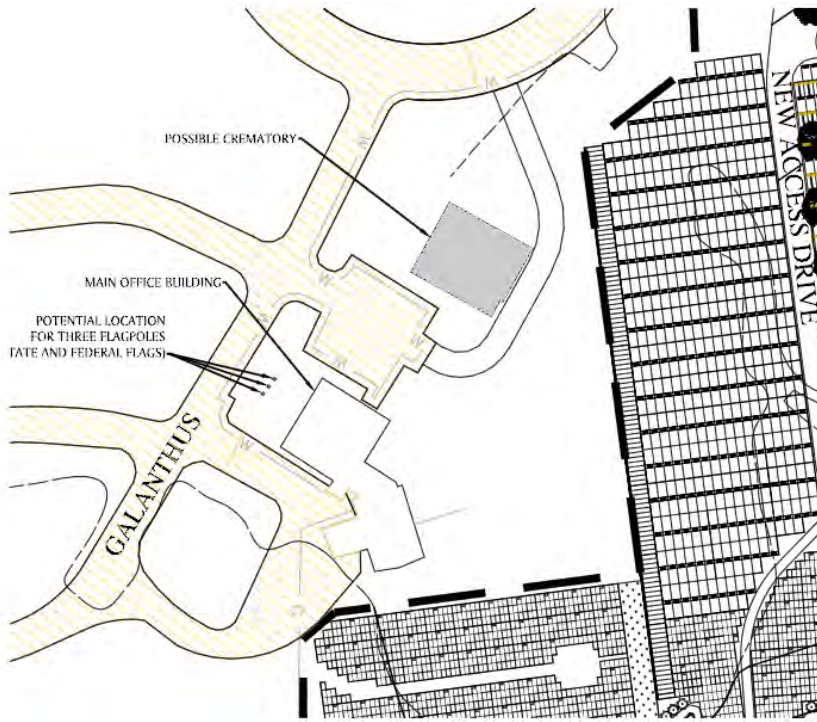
Conceptual Site Plan of Possible Crematory Location
